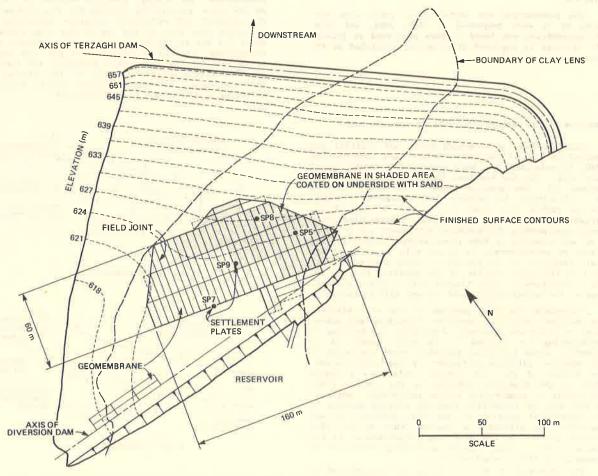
PLAN OF UPSTREAM SLOPE OF TERZAGHI DAM
